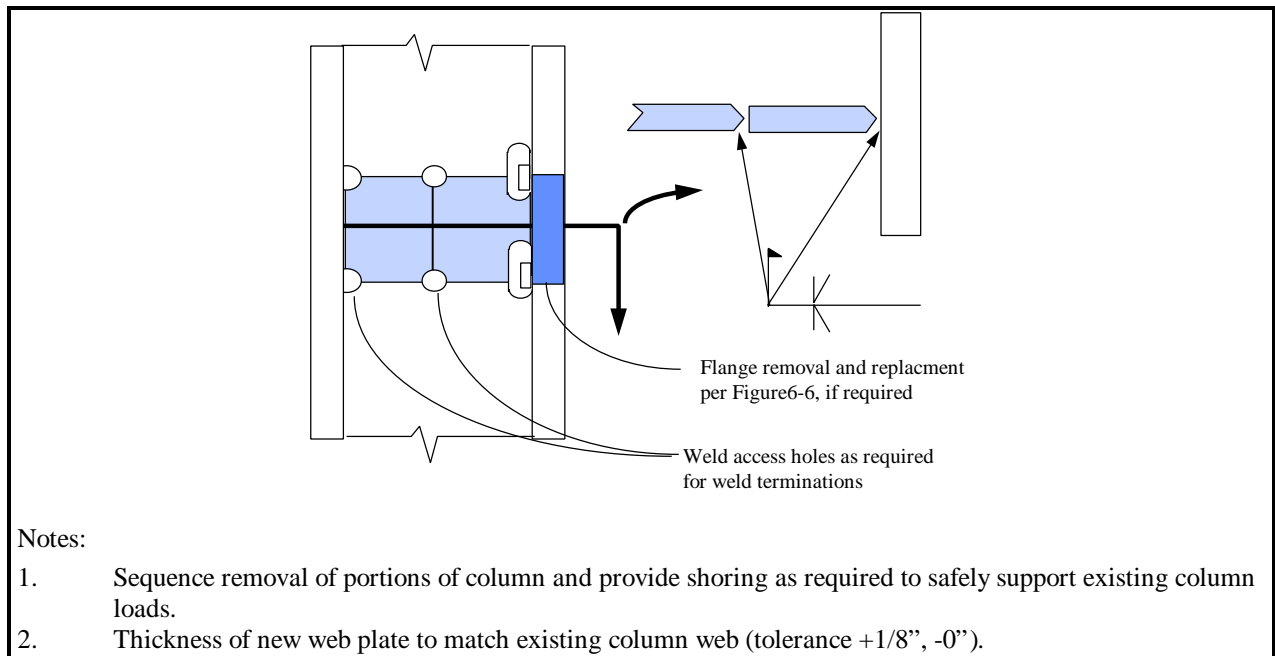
Alternate Column Web Repair - Columns without Doubler Plates
